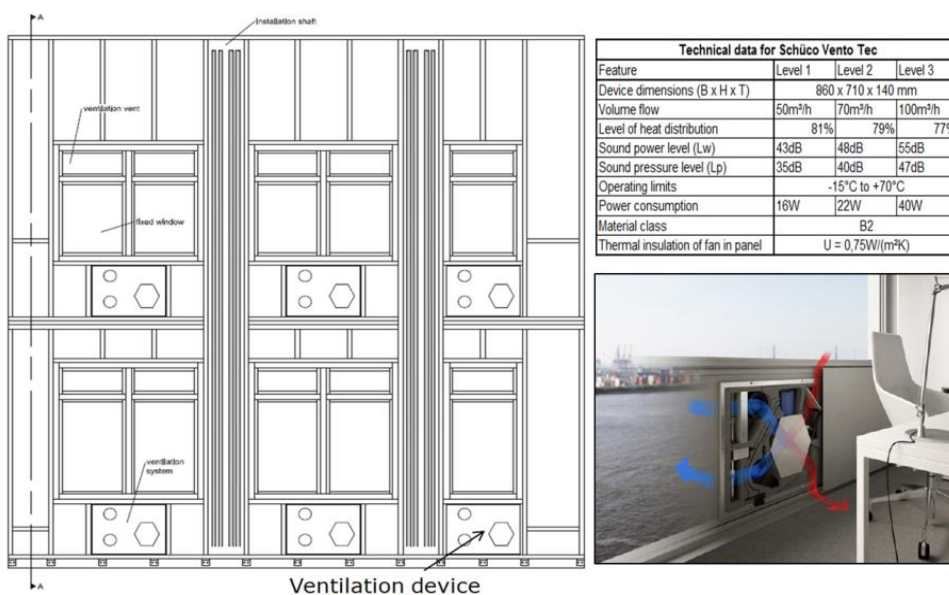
Façade design showing the vertical installation channels for tubes and ducts
